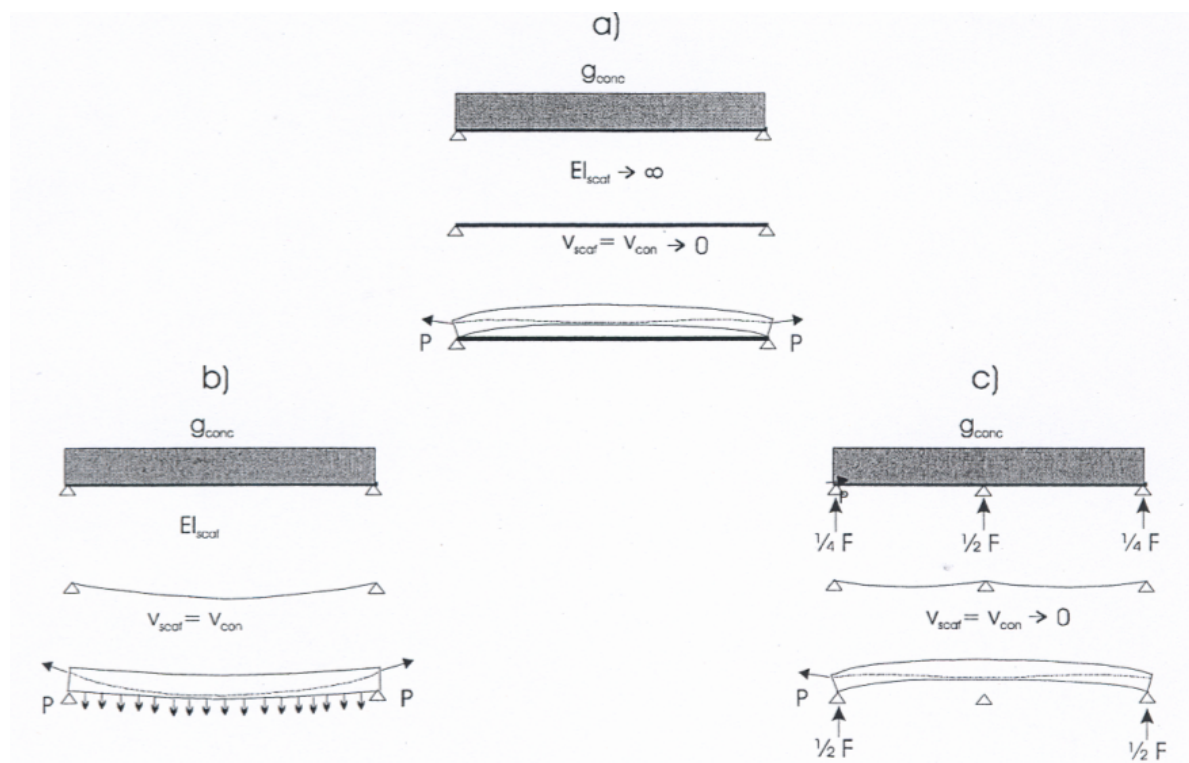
Prestressed beam on a) stiff scaffold, b) elastic scaffold and c) scaffold supported by columns
